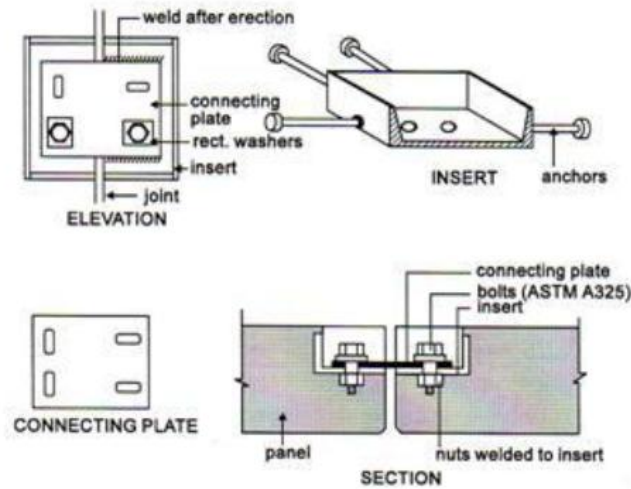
Typical details of a simple wall-to-wall Limited Slip Bolted (LSB) joint (Pall et al. 1980)
